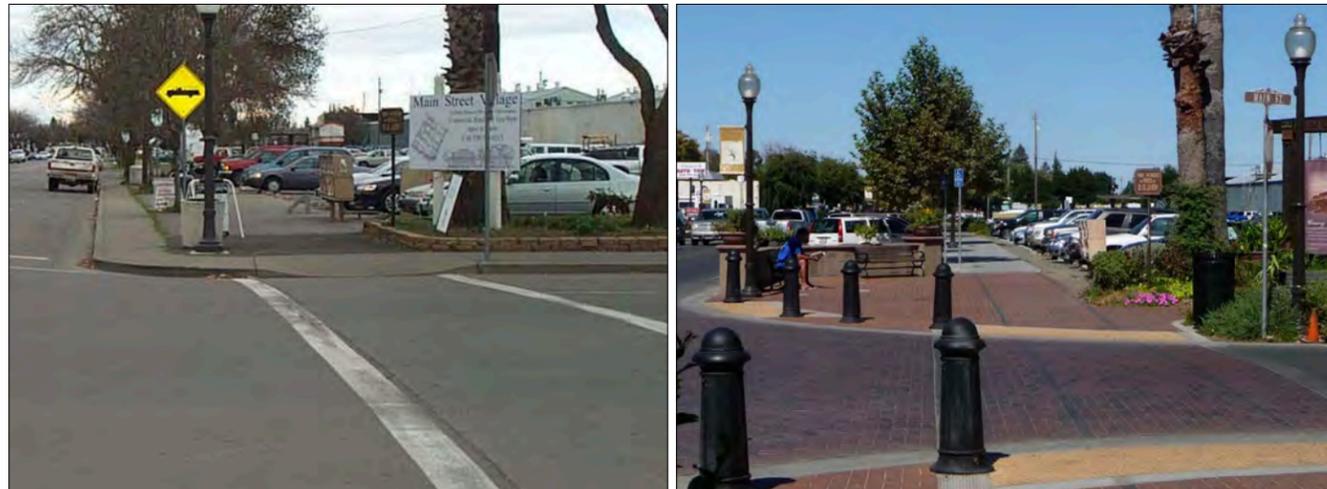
Before (left) and after (right) streetscape renovation of Railroad Avenue.
